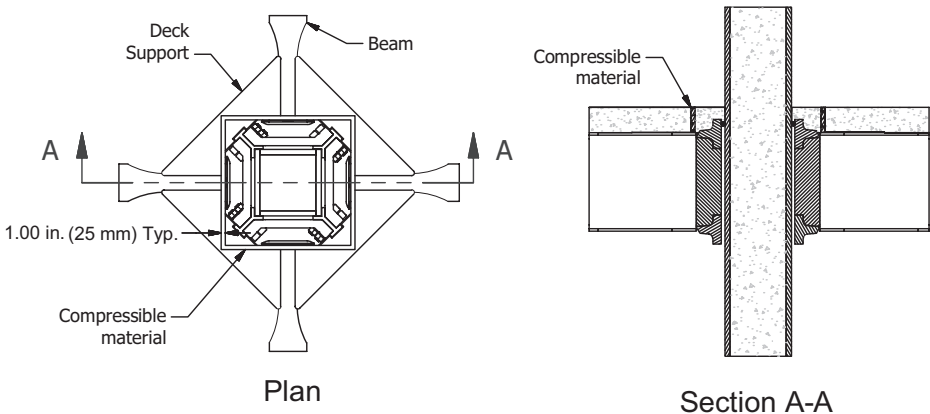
Use of compressible material to isolate structural slab from connection.
